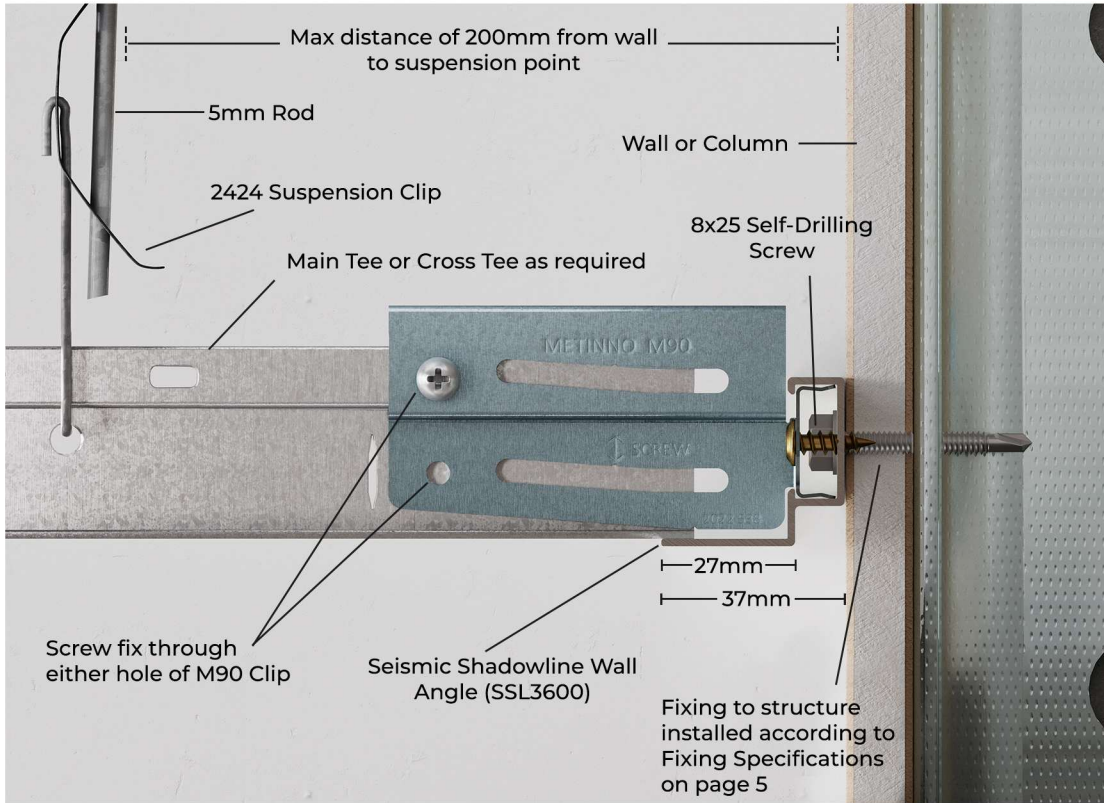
Fixed Ceiling-Wall Connection with M90 Clip
